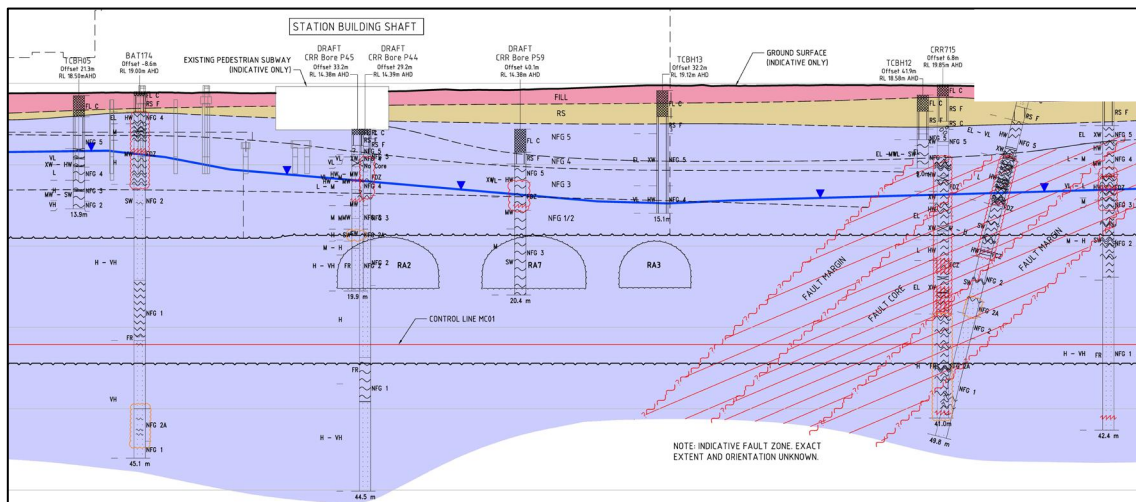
Roma Street Station geotechnical section – showing inferred fault zone intersecting the cavern.
